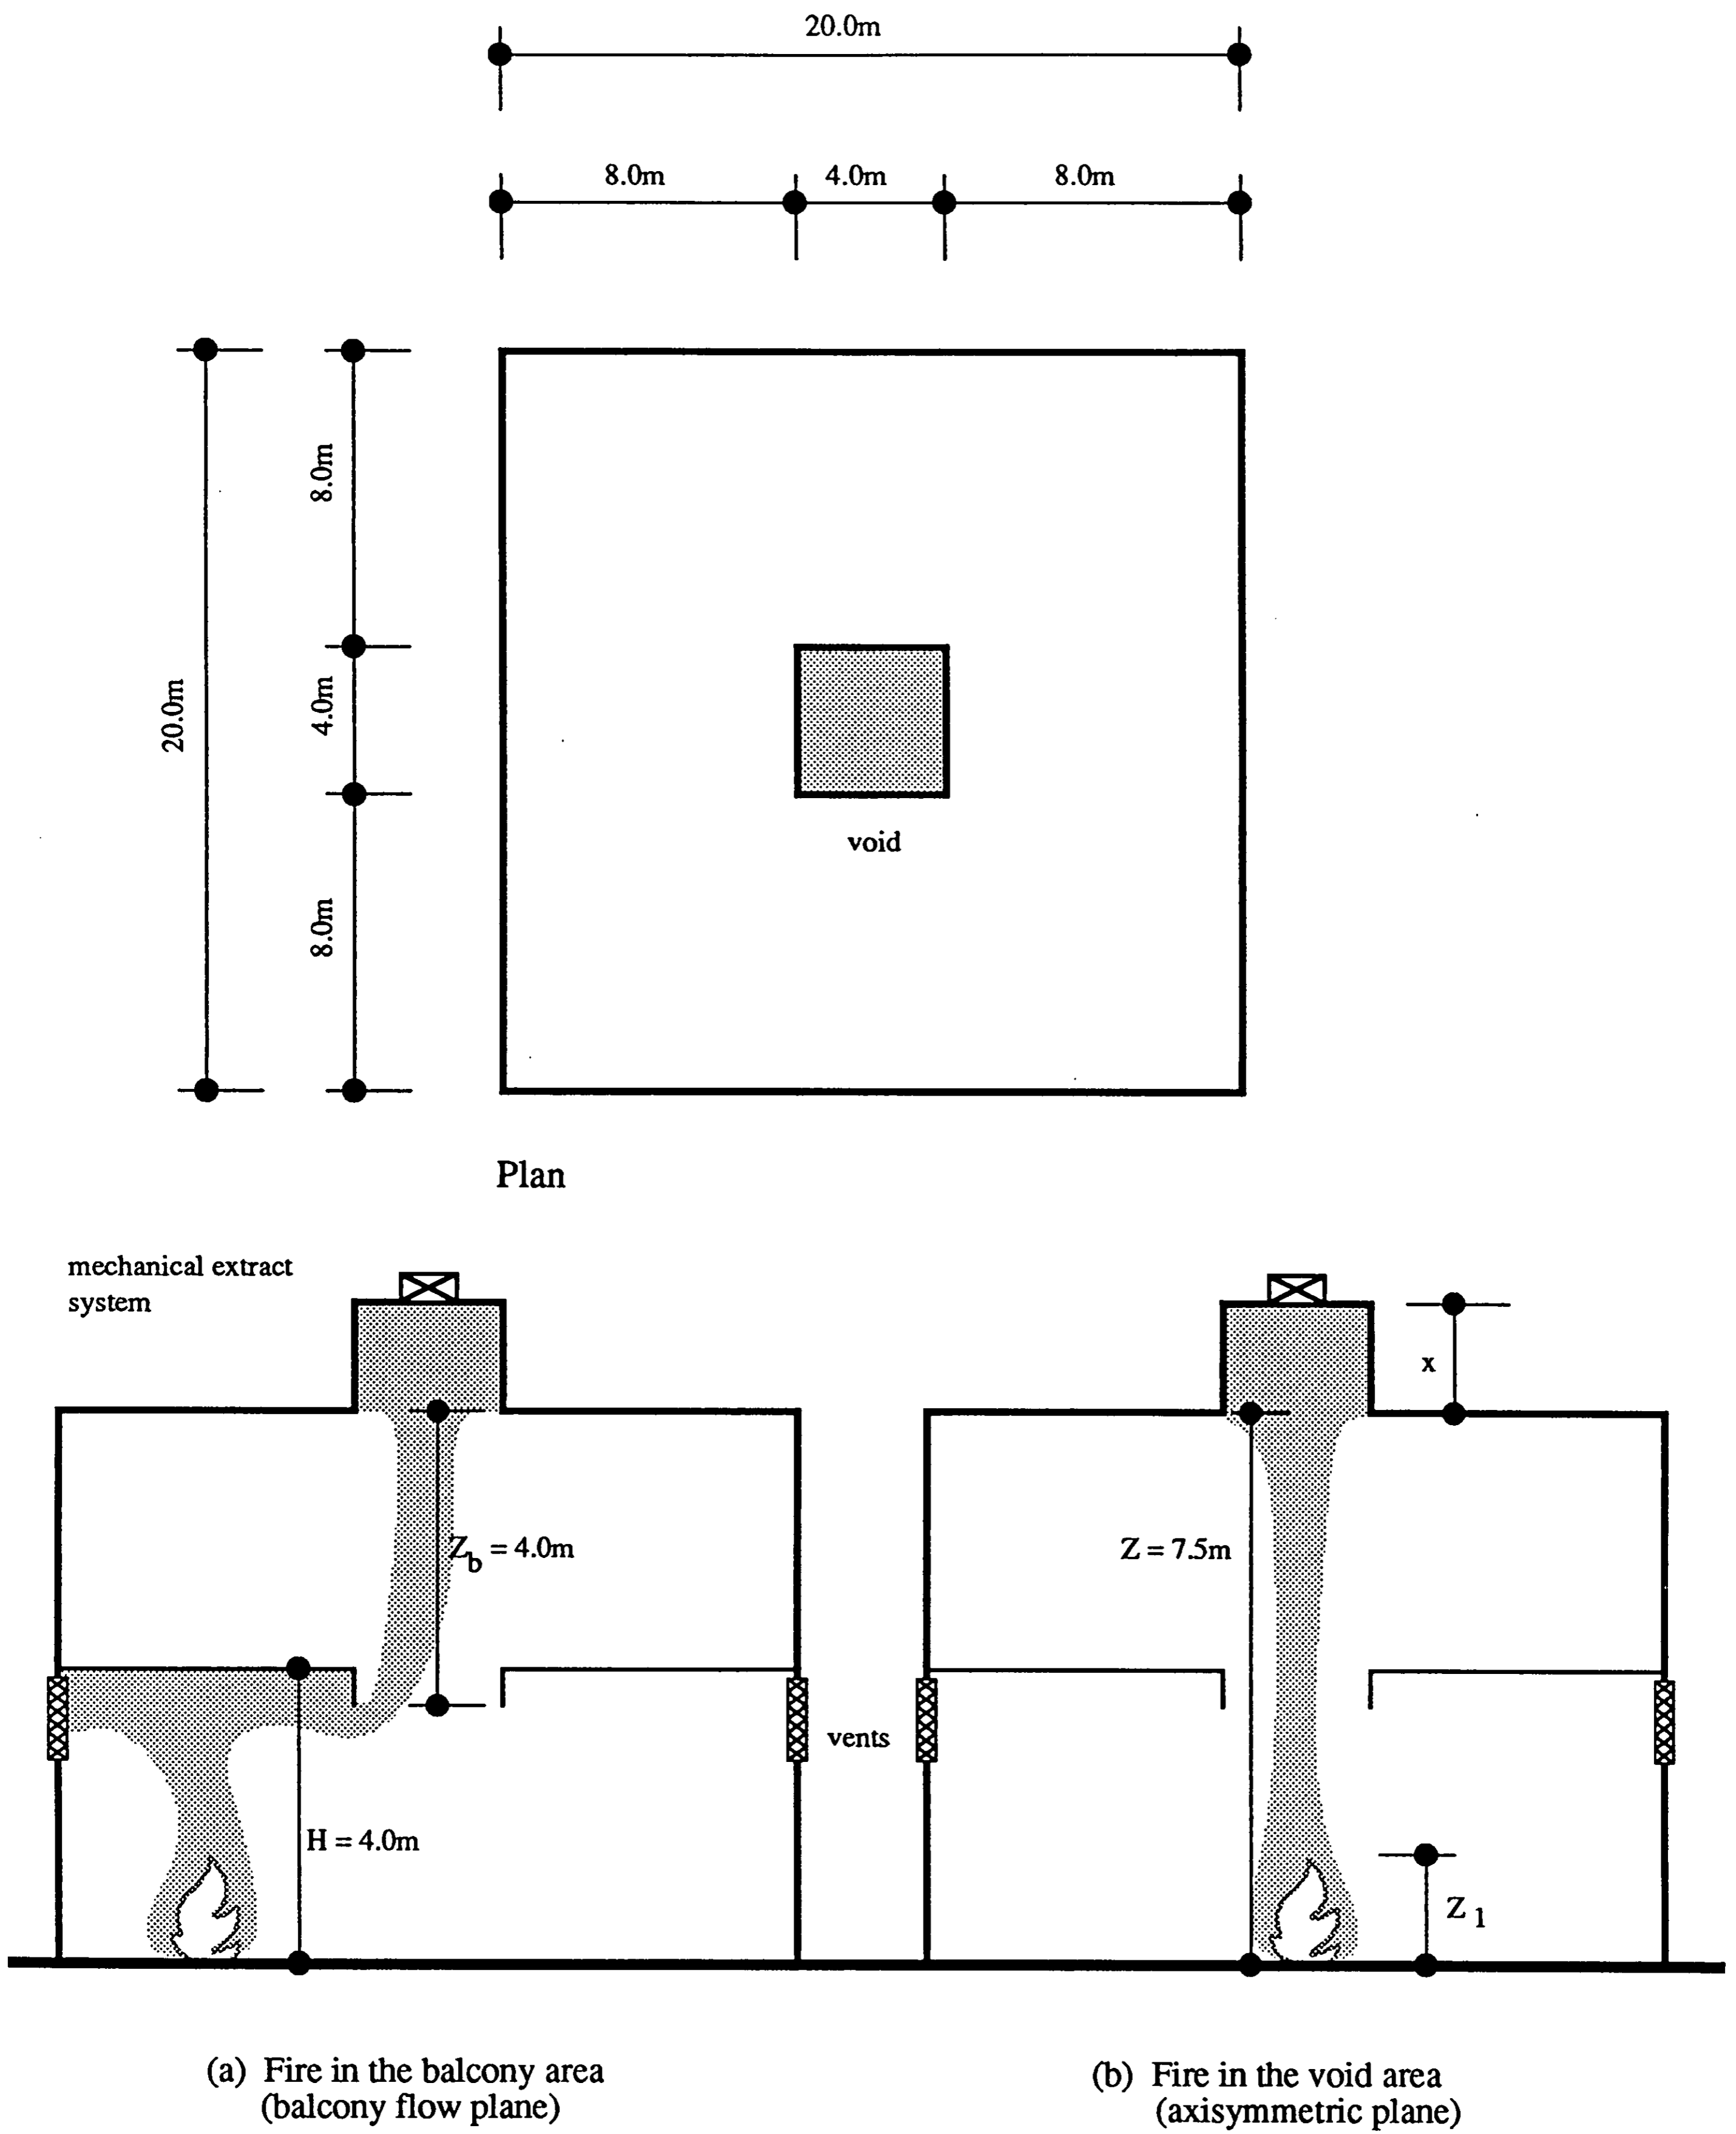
Plan and elevation of sample building used for smoke extraction calculations.
